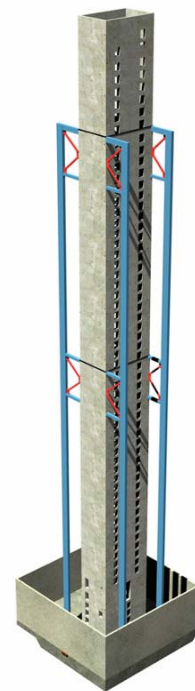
Schematic of seismic-force-resisting system of 60-story building in San Francisco (Magnusson - Klemencic)
